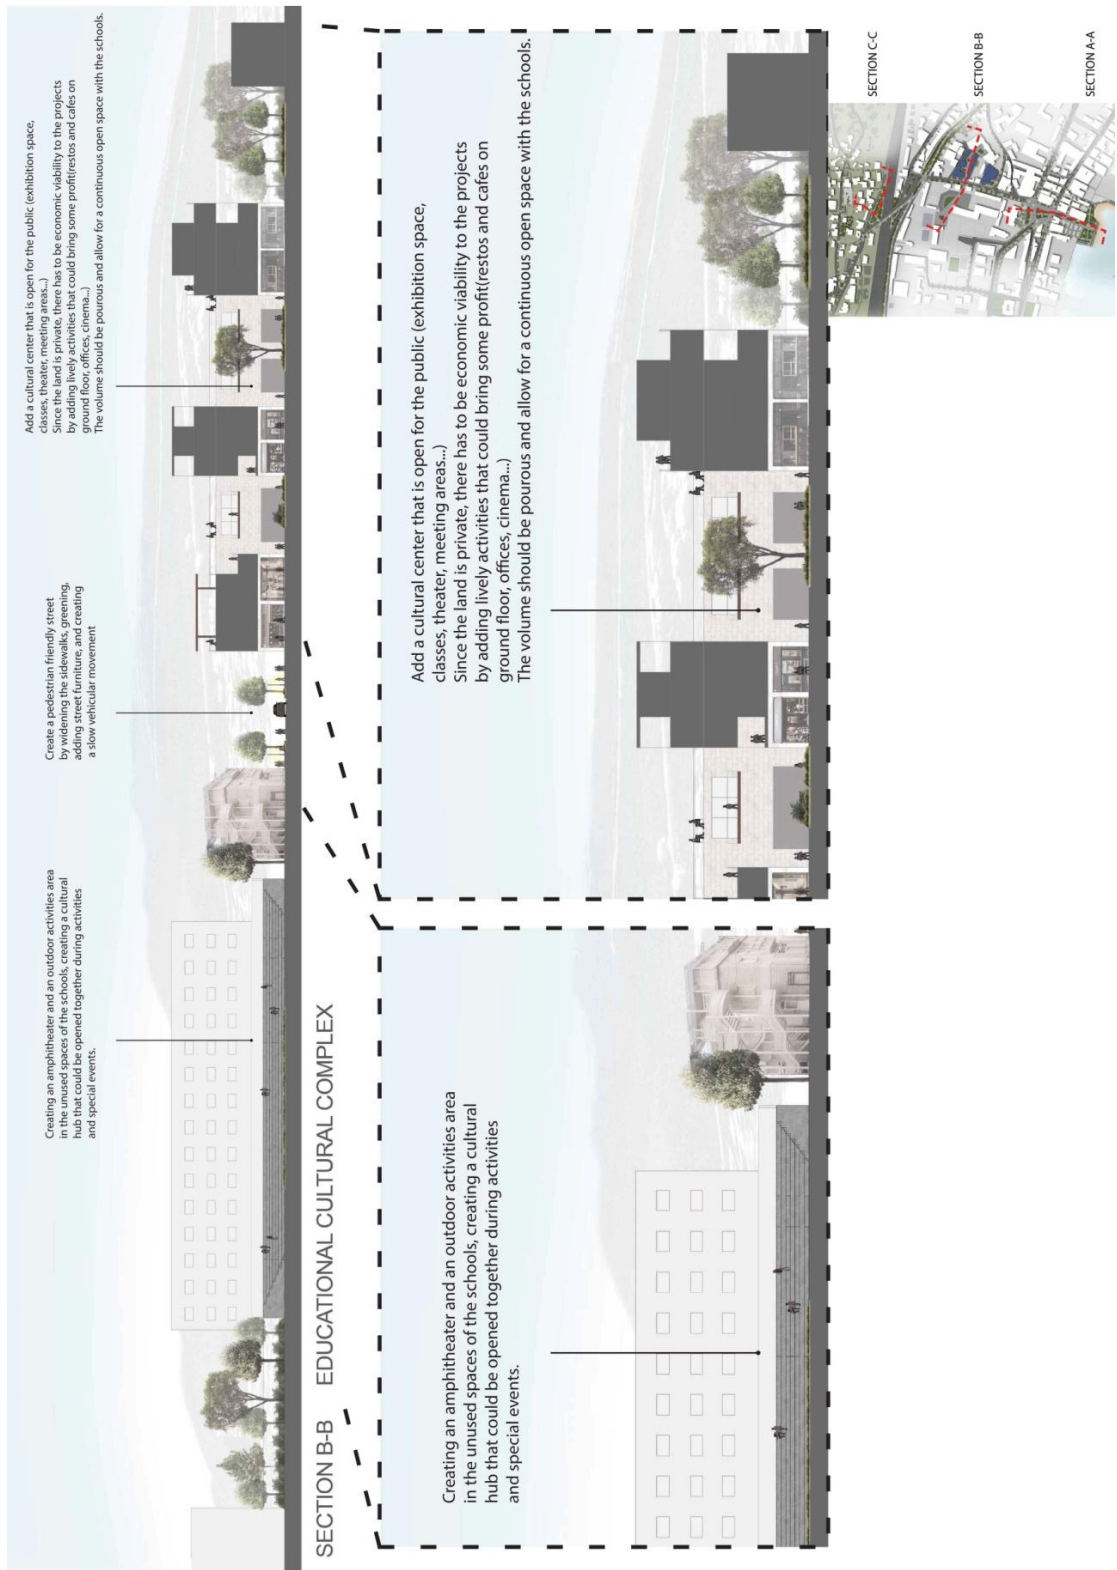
Detailed section B-B for the design proposal cutting through cultural zone (Koobayssi, R., 2018)
